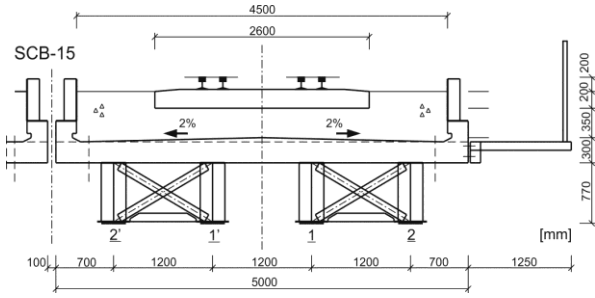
Cross-section of symmetric SCB-15 bridge, with composite side walls, at midspan
